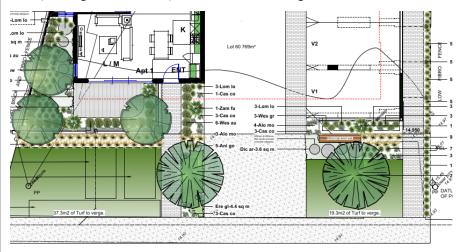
Extract of the proposed landscaping plan showing front setback area.
